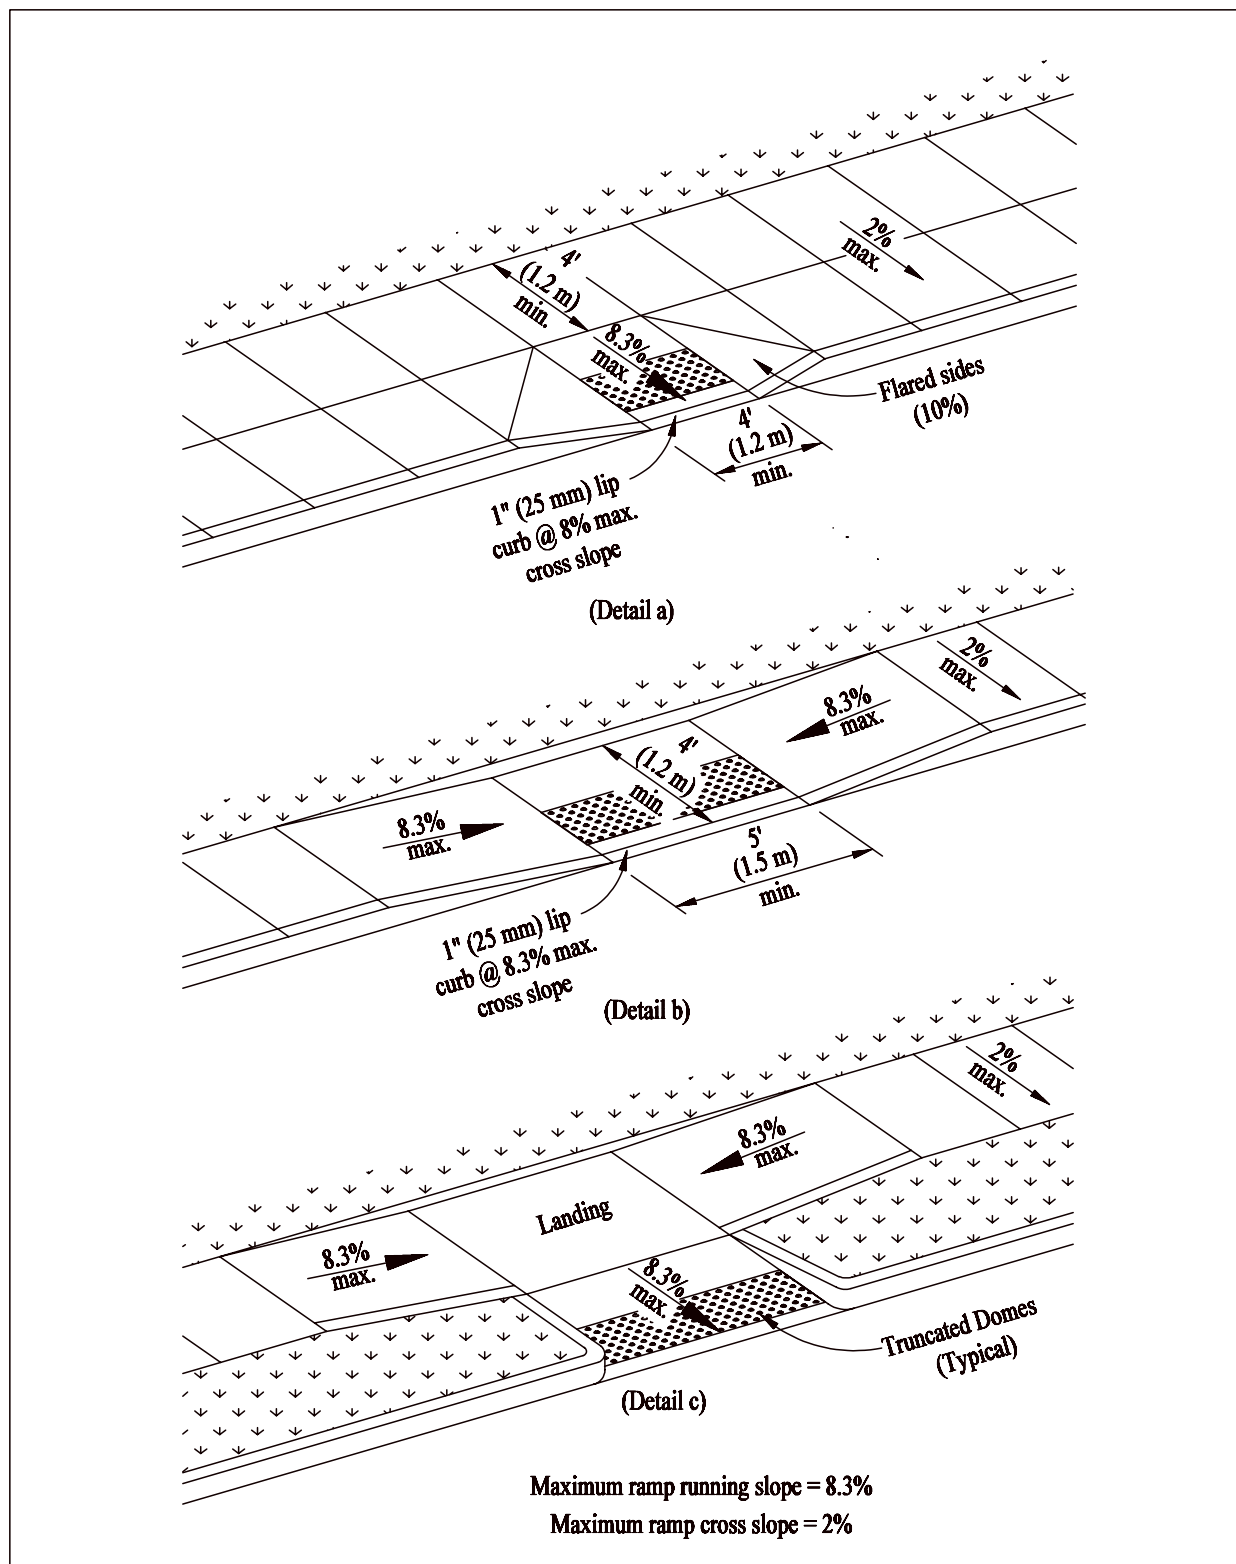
Public Sidewalk Curb Ramps (Source: Adapted from Reference 10.11)
